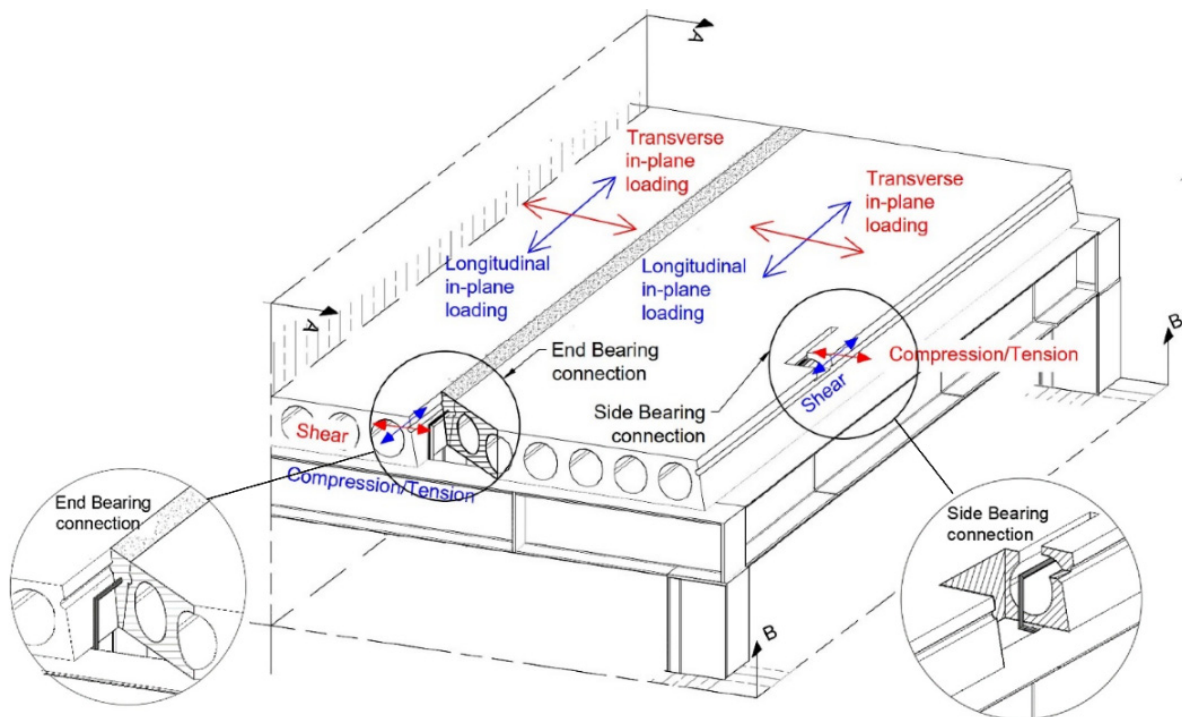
Forces on end- and side-bearing connections of HCS supported on steel beams.
